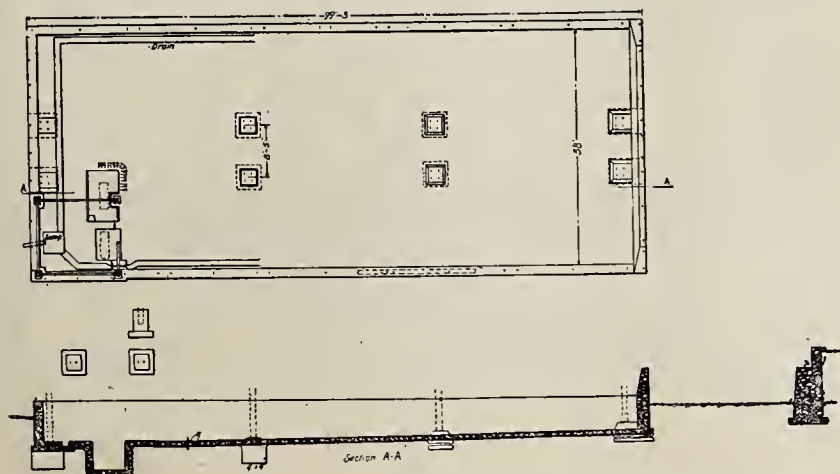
FOUNDATION PLAN P. & L. E. SAND HOUSE.
